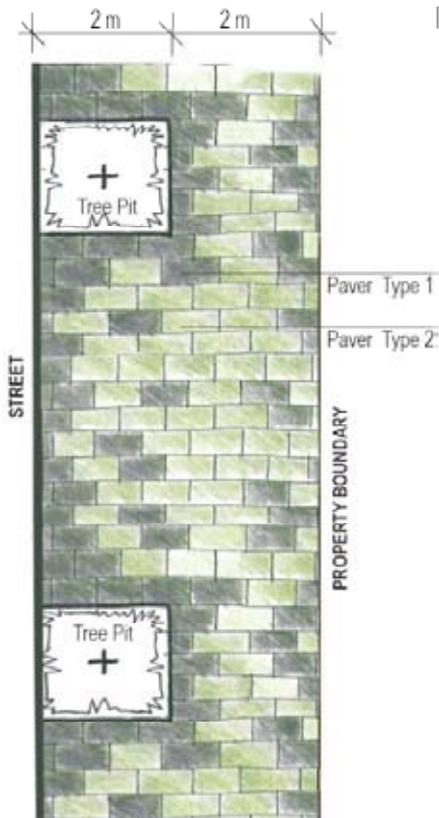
(c) – Footpath Paving – Town Centre Principal Street
